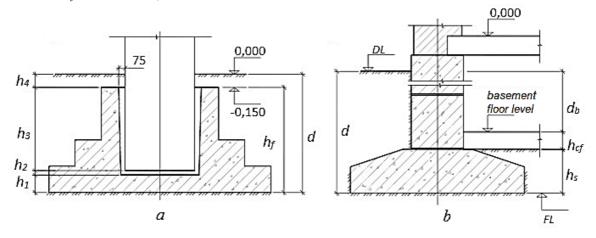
Scheme for determining the depth of the foundation depending on the design features: a — for a columnar foundation without a basement; b — for a strip foundation with a basement
